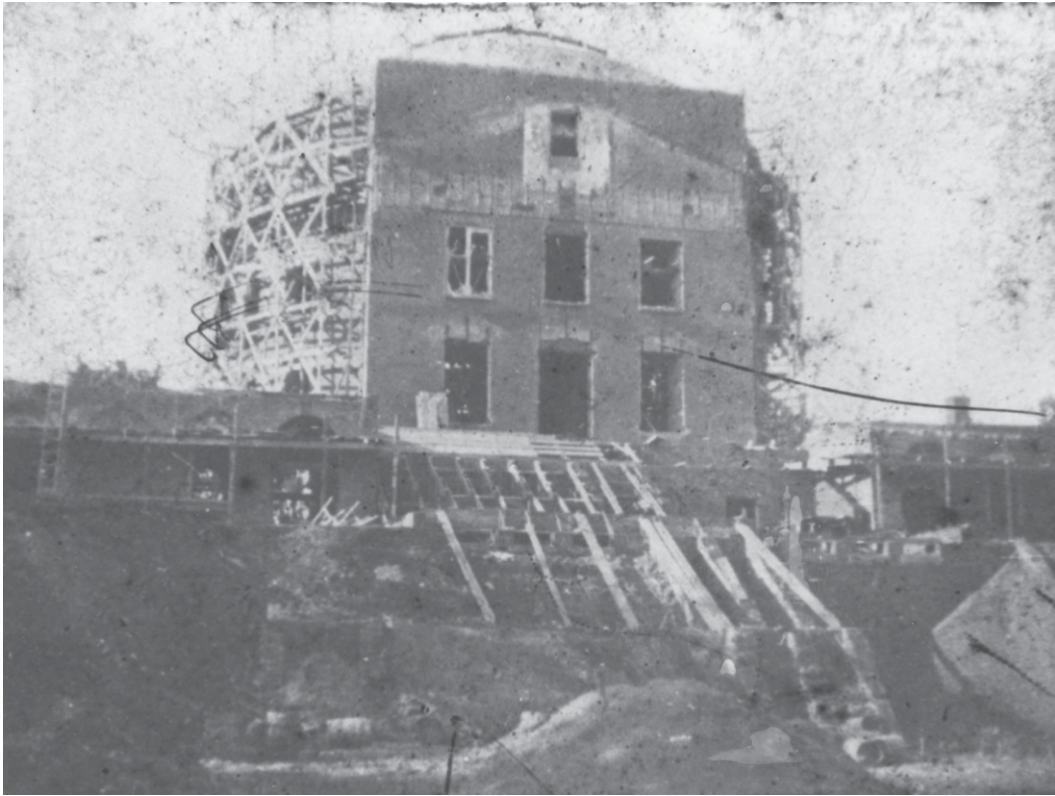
The Rotunda under construction, from the north, 1896, from the Turner Family album. [MSS 10622, Special Collections, UVA]
